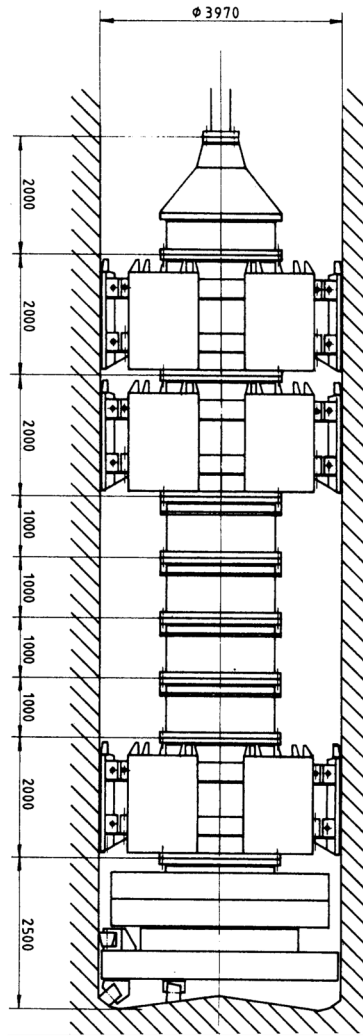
WIRTH bottom-hole-assembly with w-shaped cutterhead
